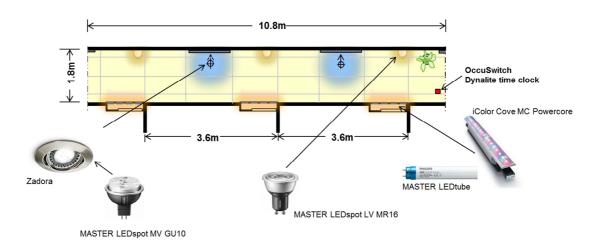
EXAMPLE OF LIGHT PLAN OF CORRIDOR
